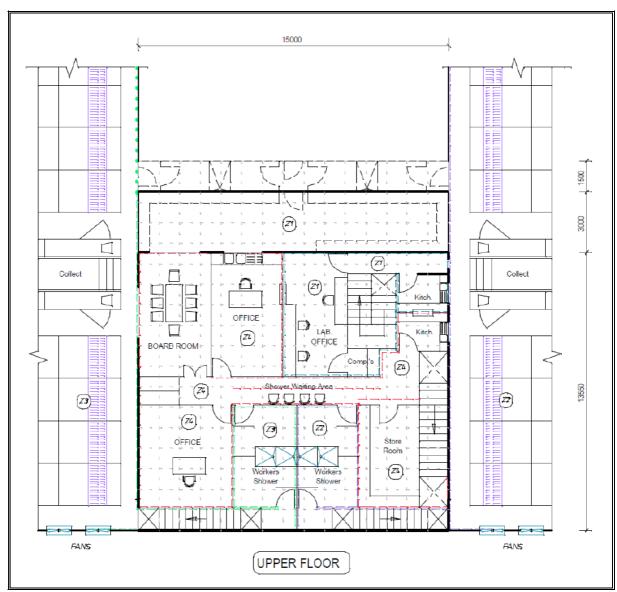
Proposed upper floor layout for the offices and laboratory (designed by Dalein Plaasbou, 2017)
